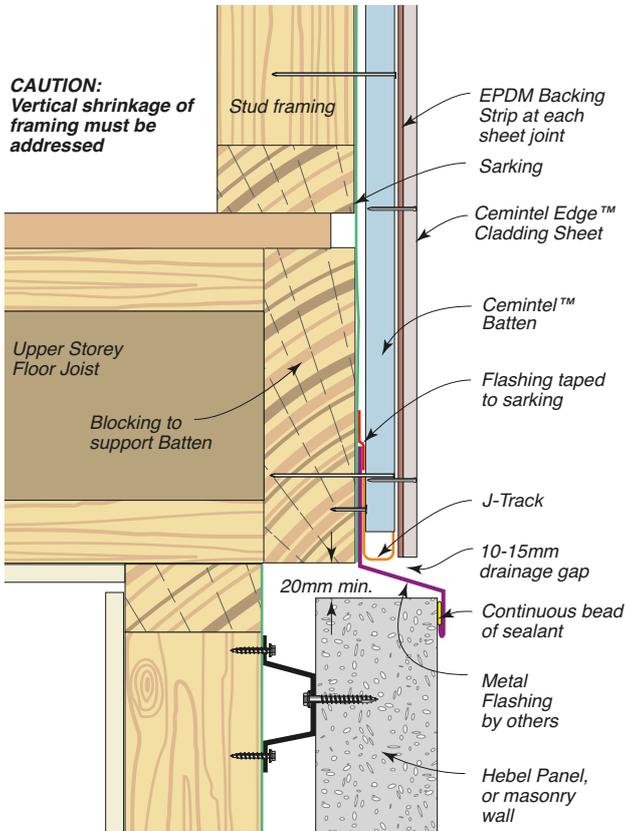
Second Storey Junction with Masonry, Brick Veneer or Hebel Panels
